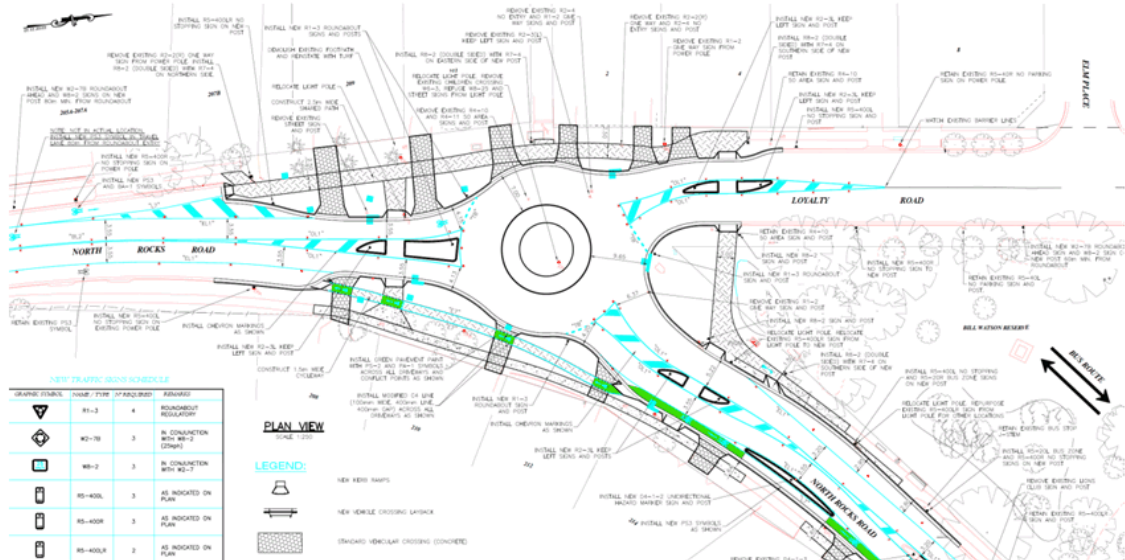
A design plan showing the proposed roundabout at the intersection of North Rocks Road and Loyalty Road, North Rocks.
